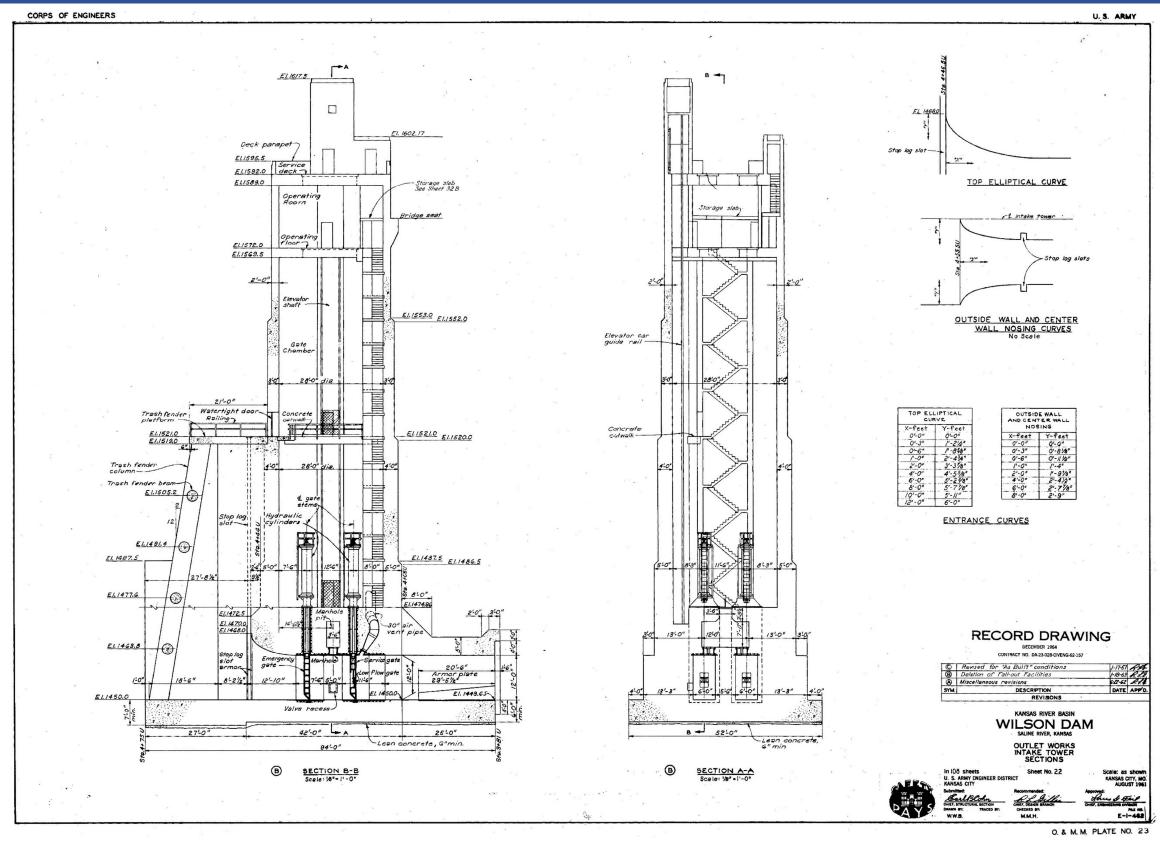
Wilson Dam Outlet Works Intake Tower Sections. Elevations are in NVGD29.
